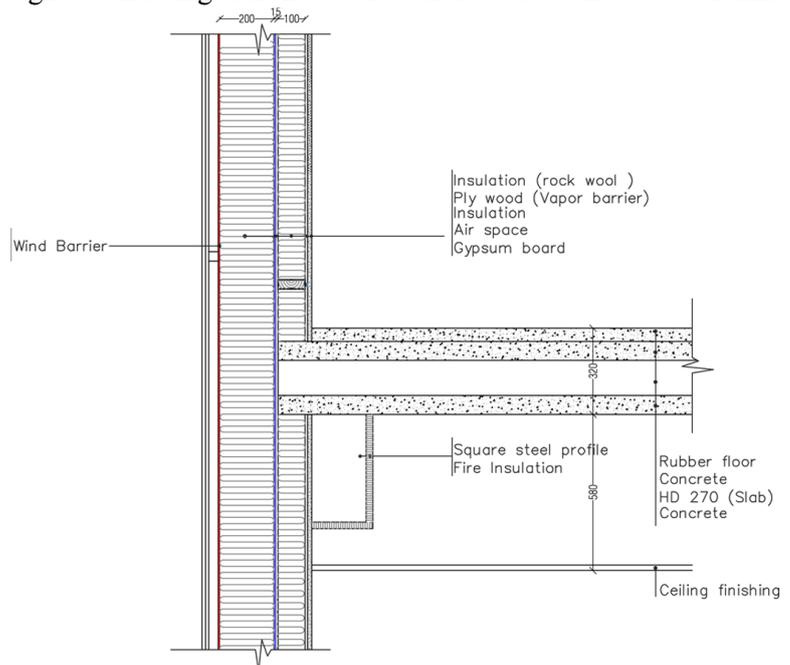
Cross section showing the structural system and the thermal insulation and wind barrier of the exterior walls.
